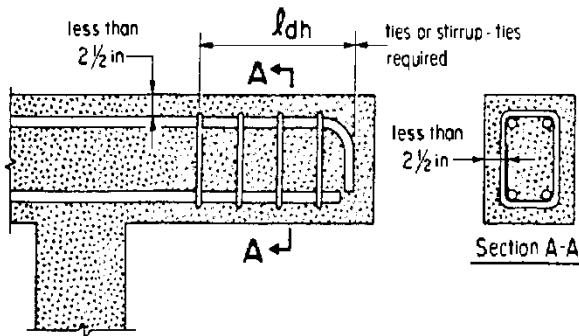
1—Hooked-Bar Tie Requirements
